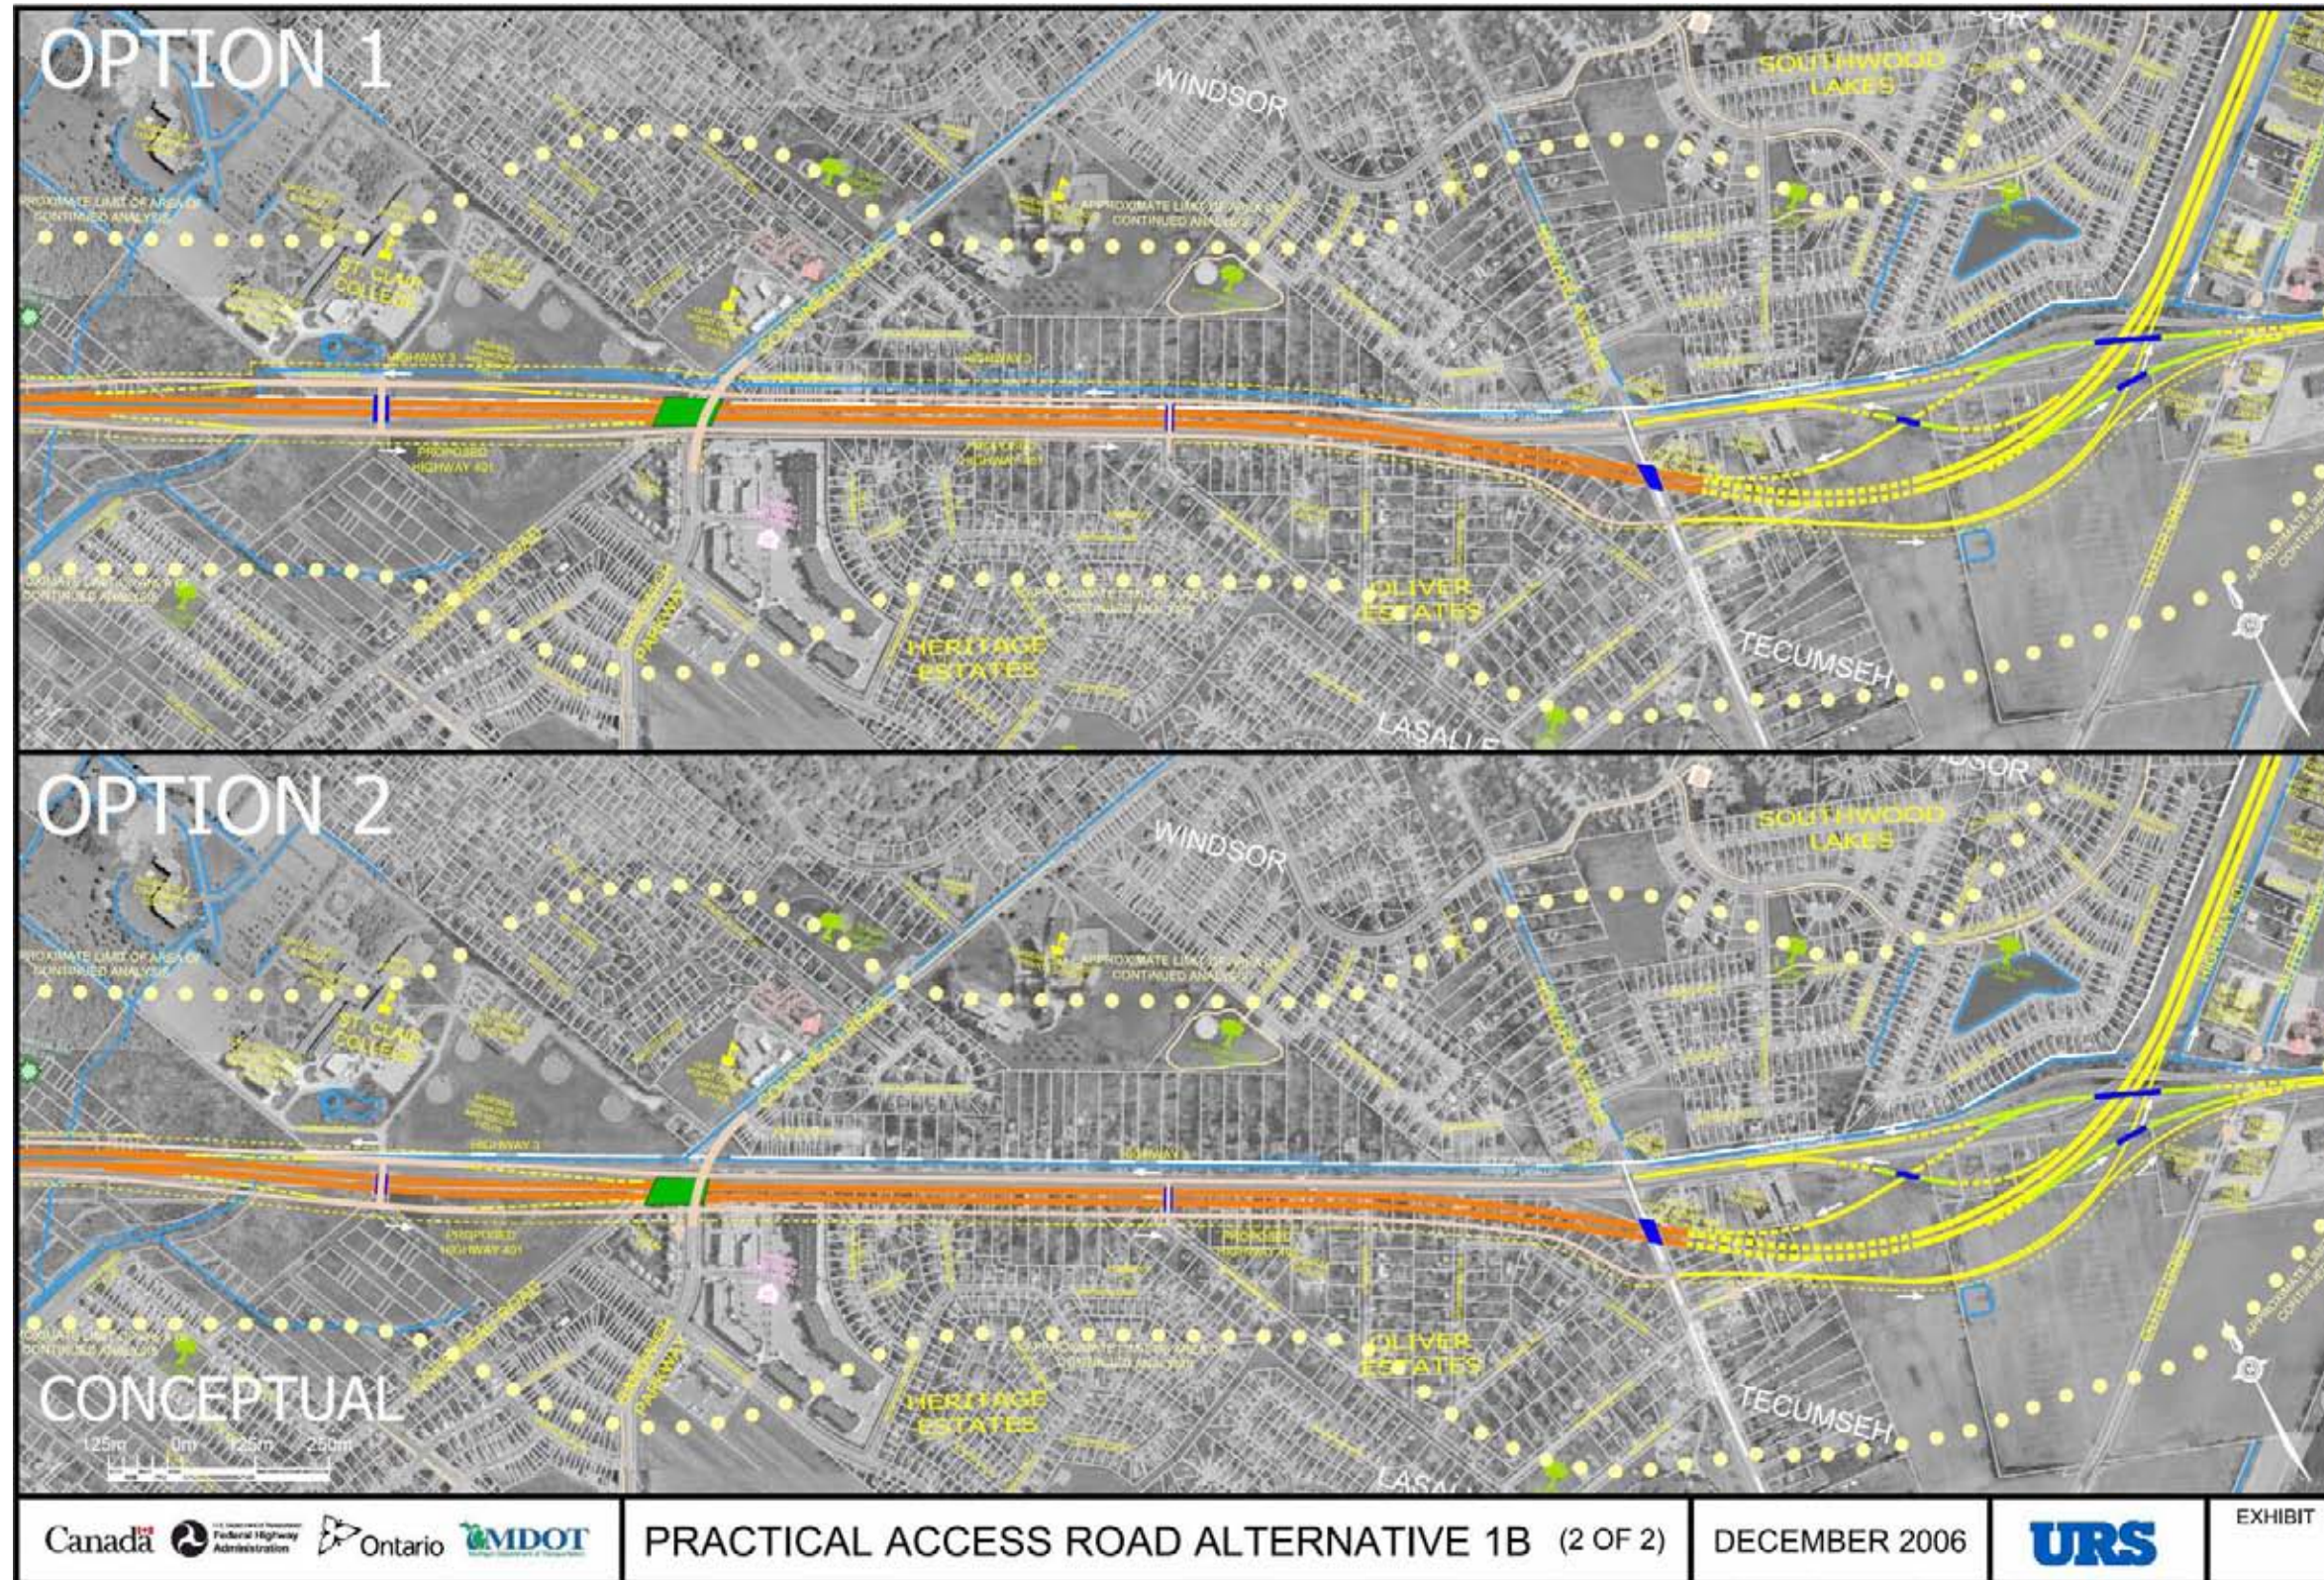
B – PRACTICAL ACCESS ROAD ALTERNATIVE 1B
